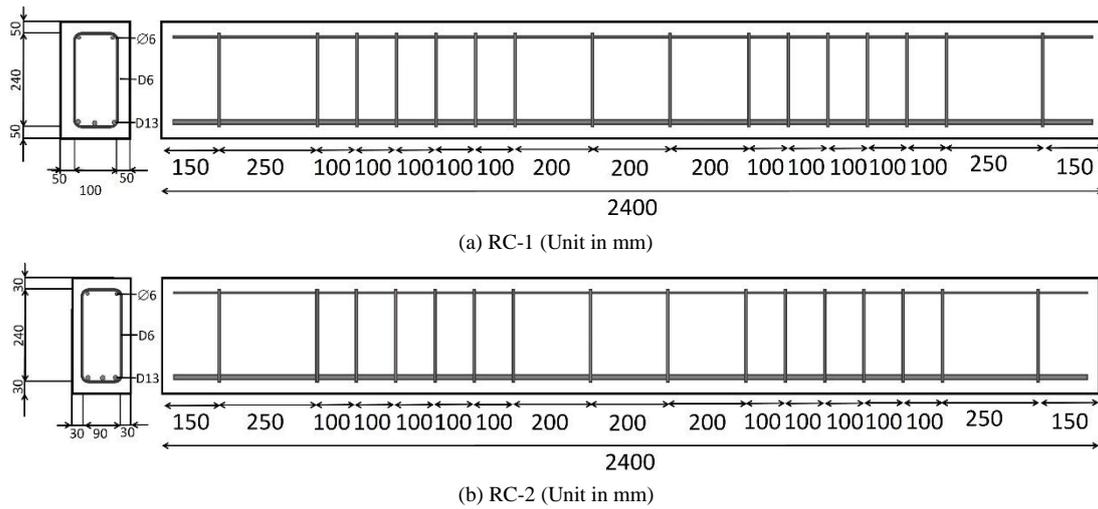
Cross-section and reinforcing bar layout of RC beams (a) RC-1 and (b) RC-2
